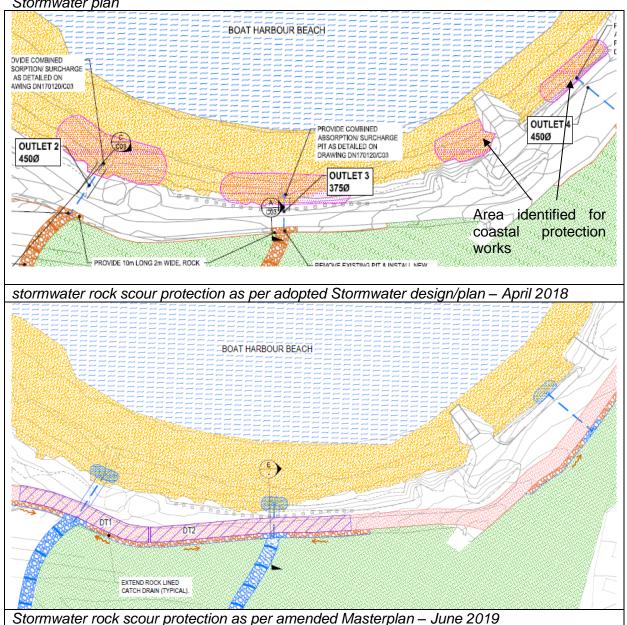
Changes to stormwater scour/embankment protection – Bendalong Boat Harbour Stormwater plan
